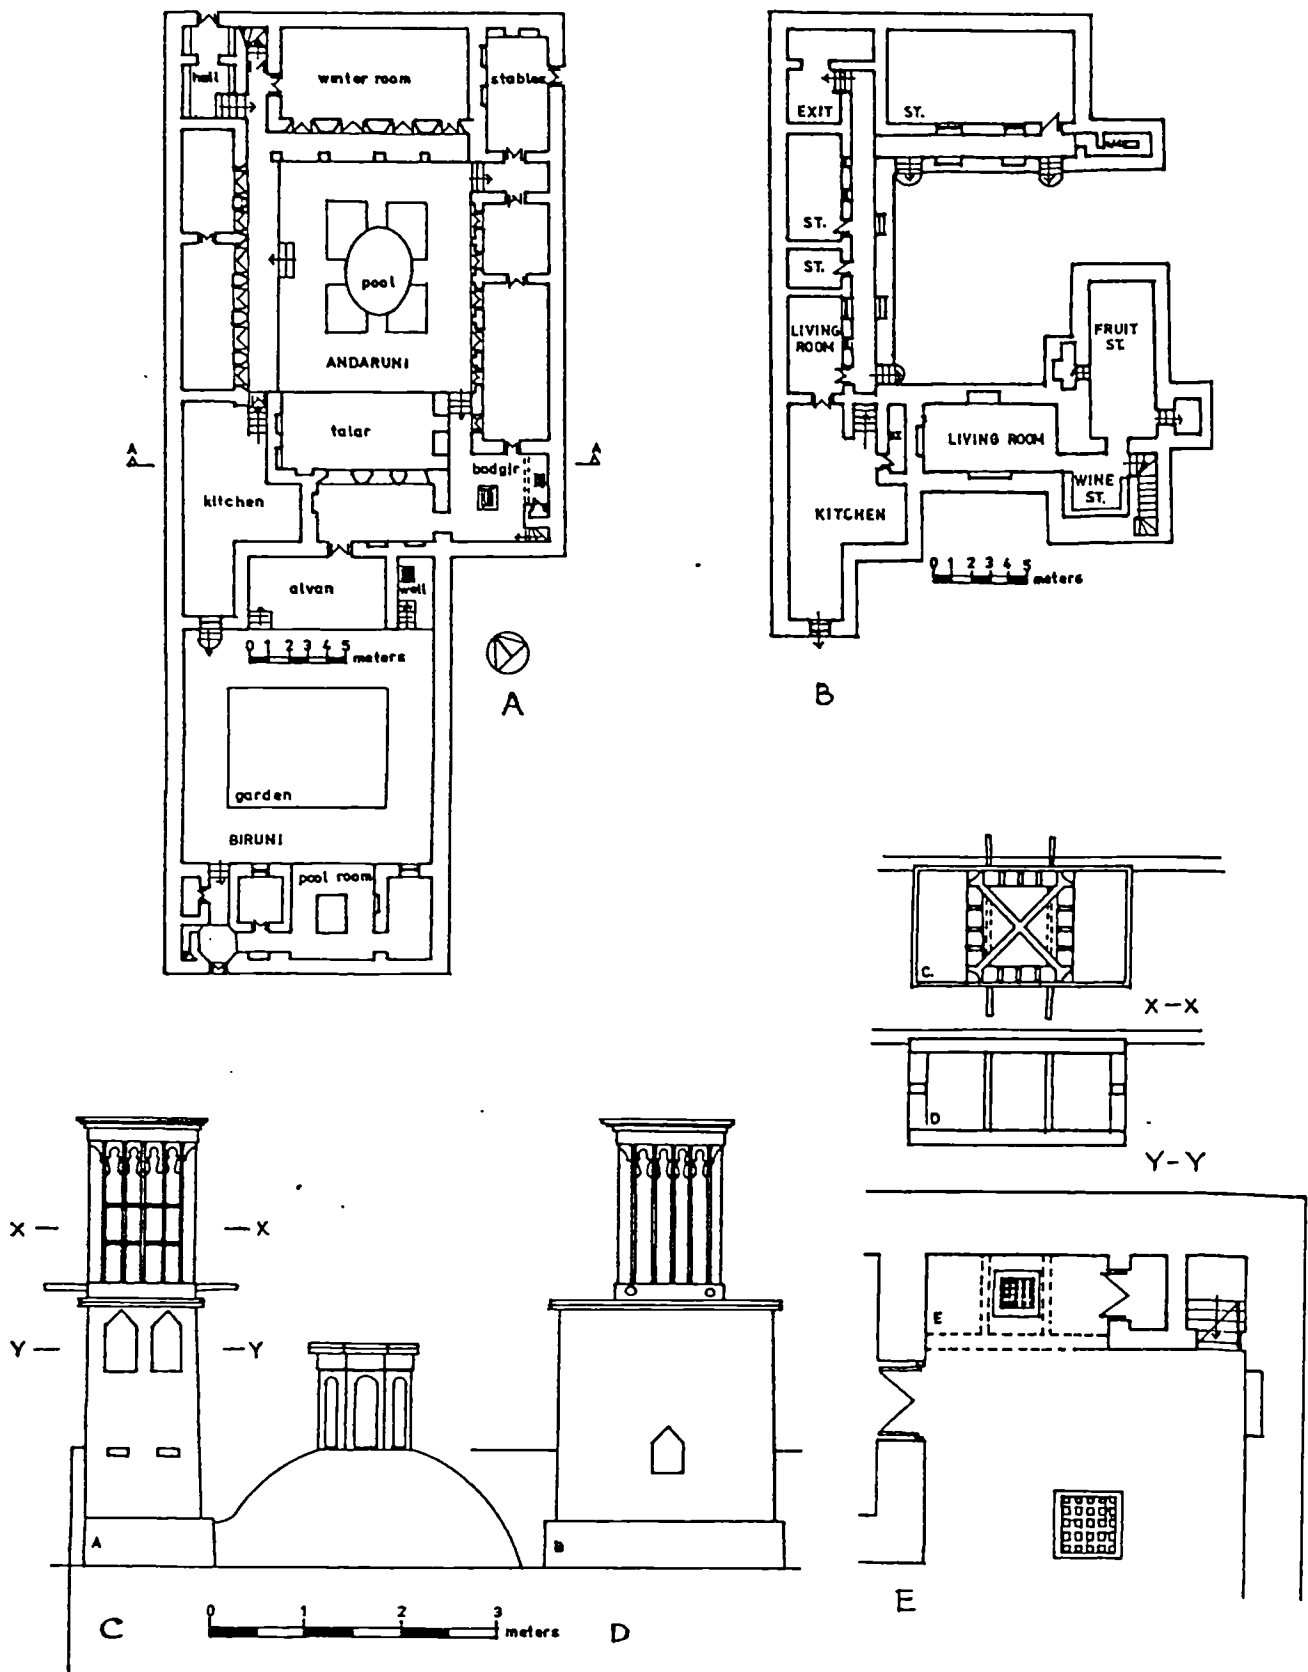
Two-storey badgir house (house B): A) Ground floor plan B) basement plan C) north-east elevation of the badgir D) north-west elevation of the badgir E) plans of the badgir at vent and ground floor level.
